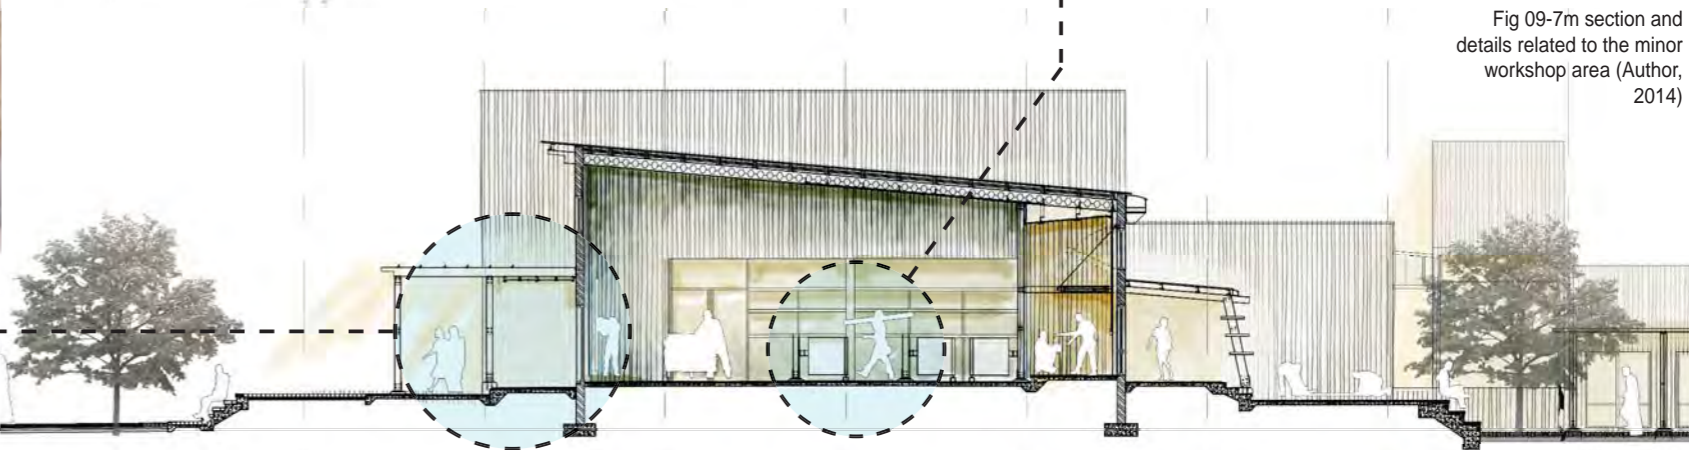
section and details related to the minor workshop area (Author, 2014)
